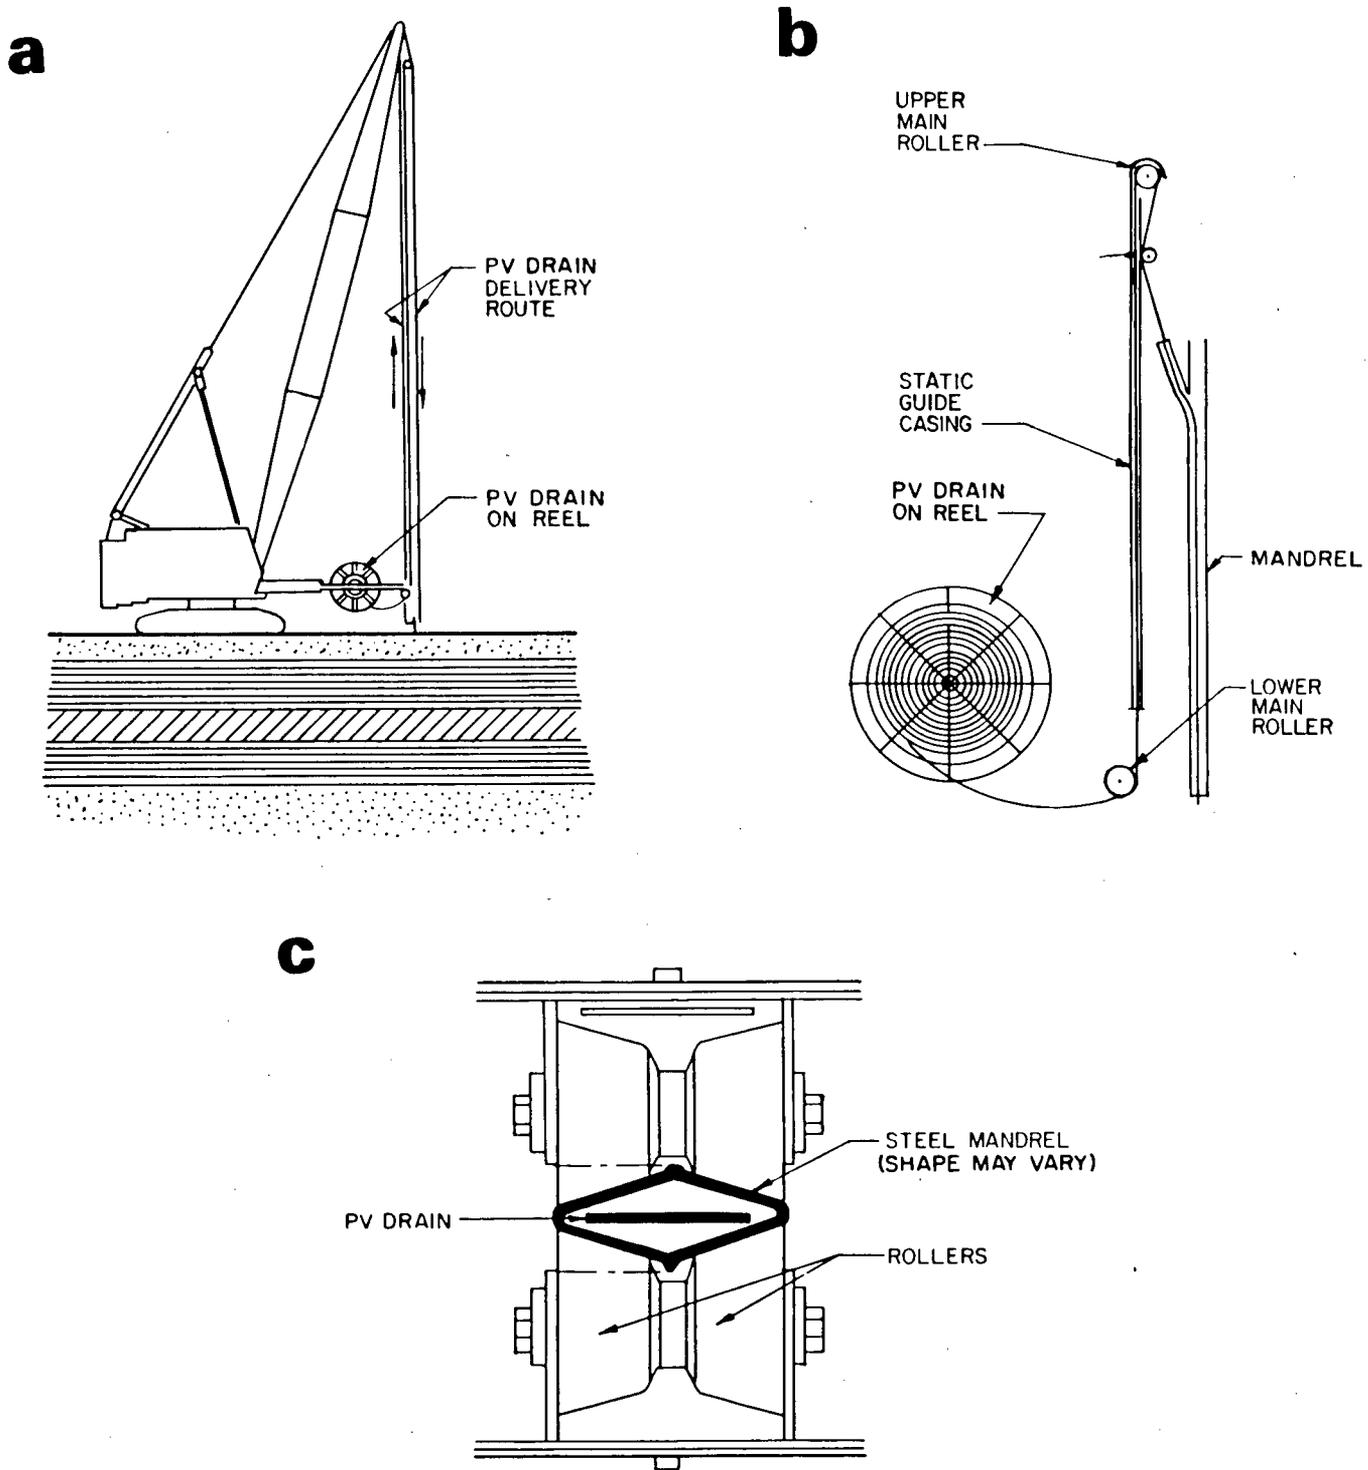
Installation of prefabricated vertical (PV) drains: (a) crane-mounted installation rig, (b) drain delivery arrangement, and (c) cross section of mandrel and drain (86).
